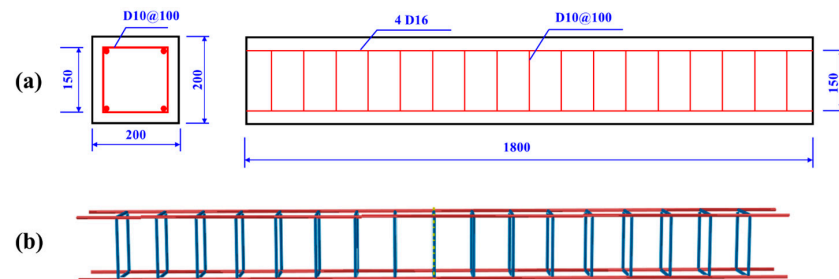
RC beam configuration: (a) cross-section view; (b) 3D view (unit: mm).
